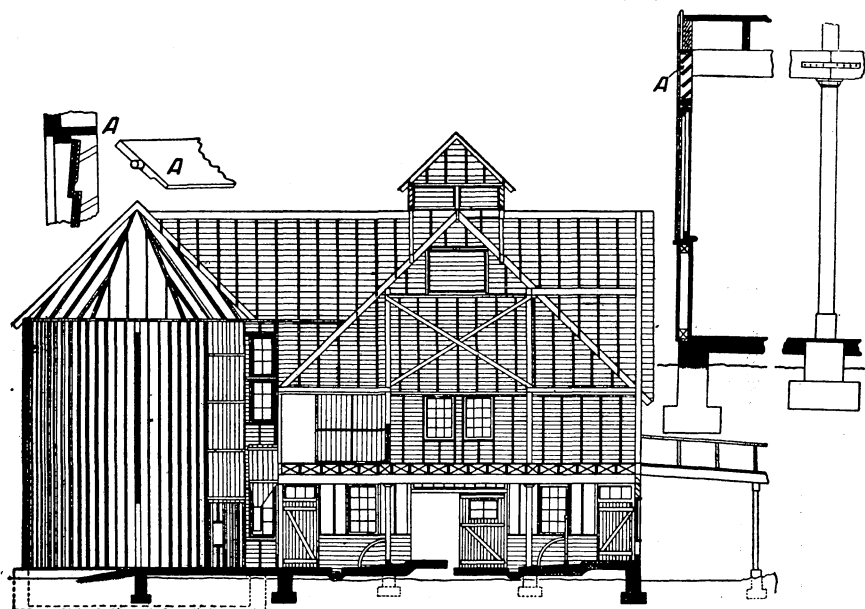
Cross section showing details of construction of stable shown in fig. 9.
